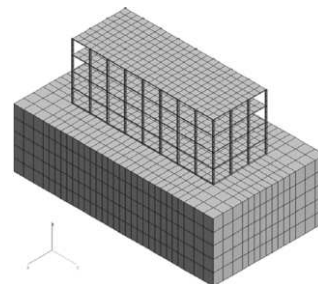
Finite-element model of the industrial construction as a system "base-foundation-building".
